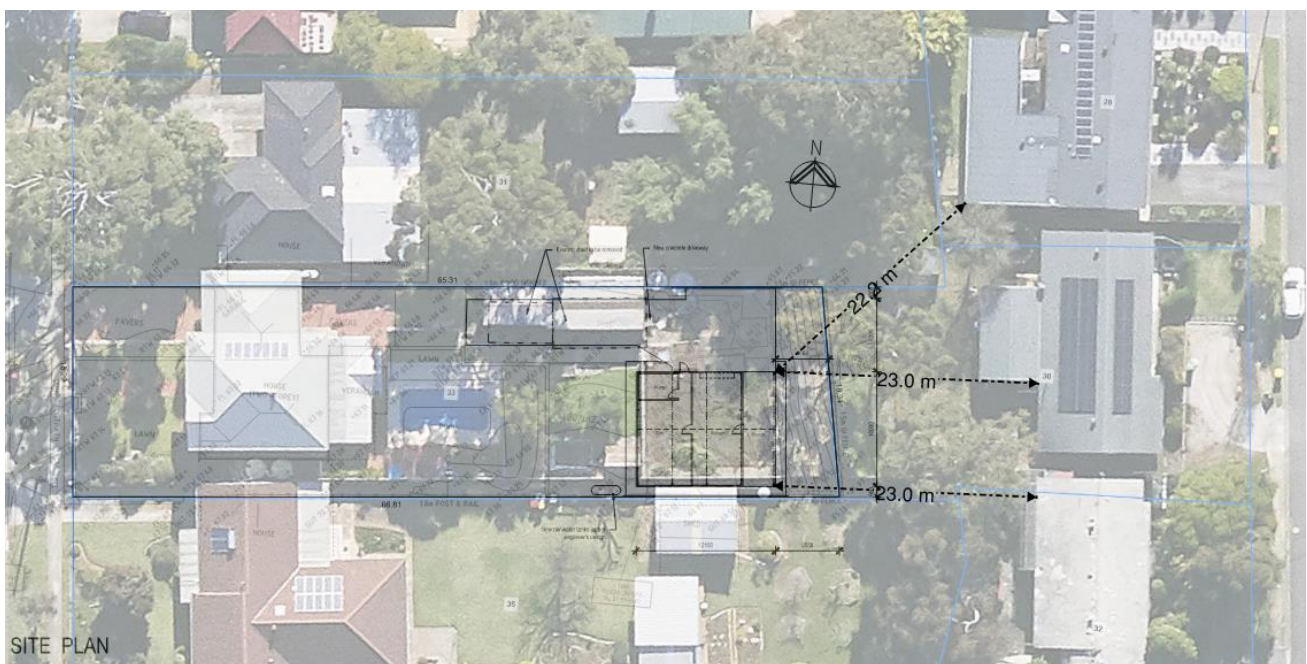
Site plan with aerial photo overlaid showing separation distances form proposed outbuilding to eastern adjoining dwellings
